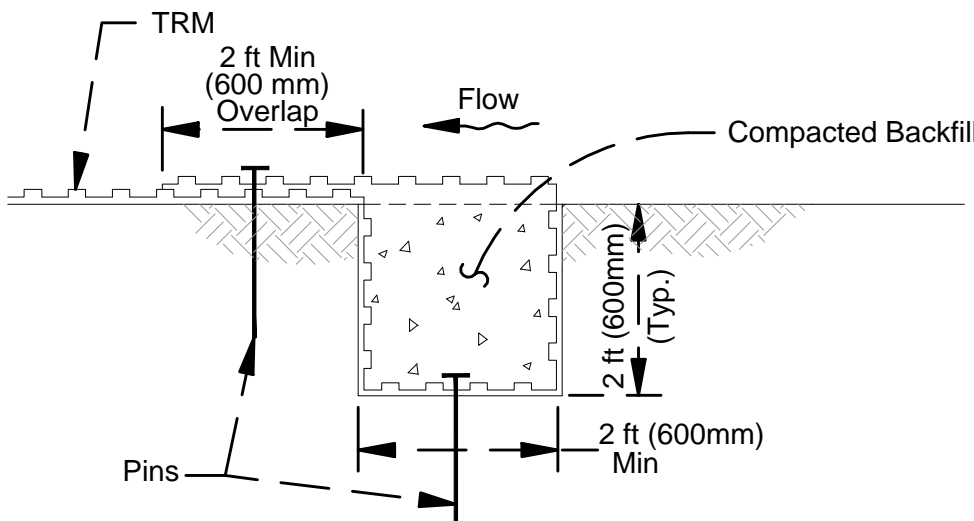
TERMINAL TRENCH (UPSTREAM) DETAIL
